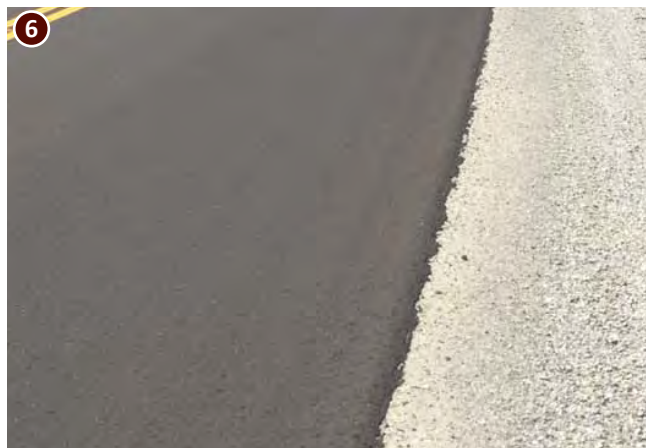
Gravel Street Apron (OttawaVeloOutaouais)
